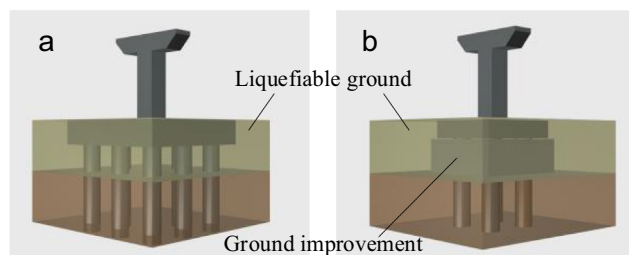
Concept of pile foundation with ground improvement: (a) Traditional 3×3 group pile foundation and (b) 2×2 group pile foundation with ground improvement.
